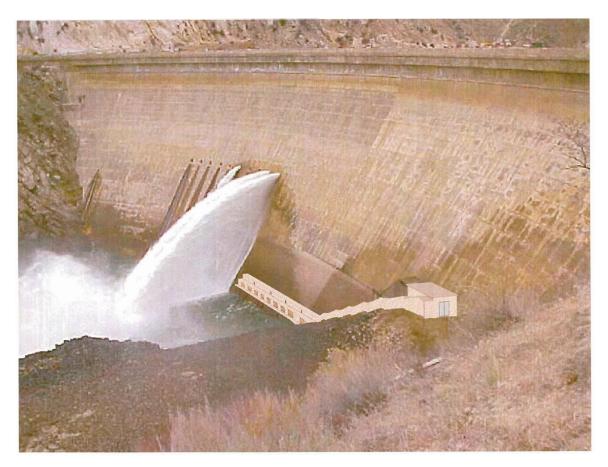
Photograph of Arrowrock Dam illustrating proposed mid-level outlet works modifications.
